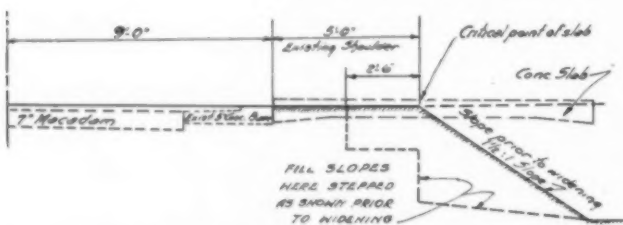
Showing How Old Fill Slopes Were Handled for Widening of Pavement
